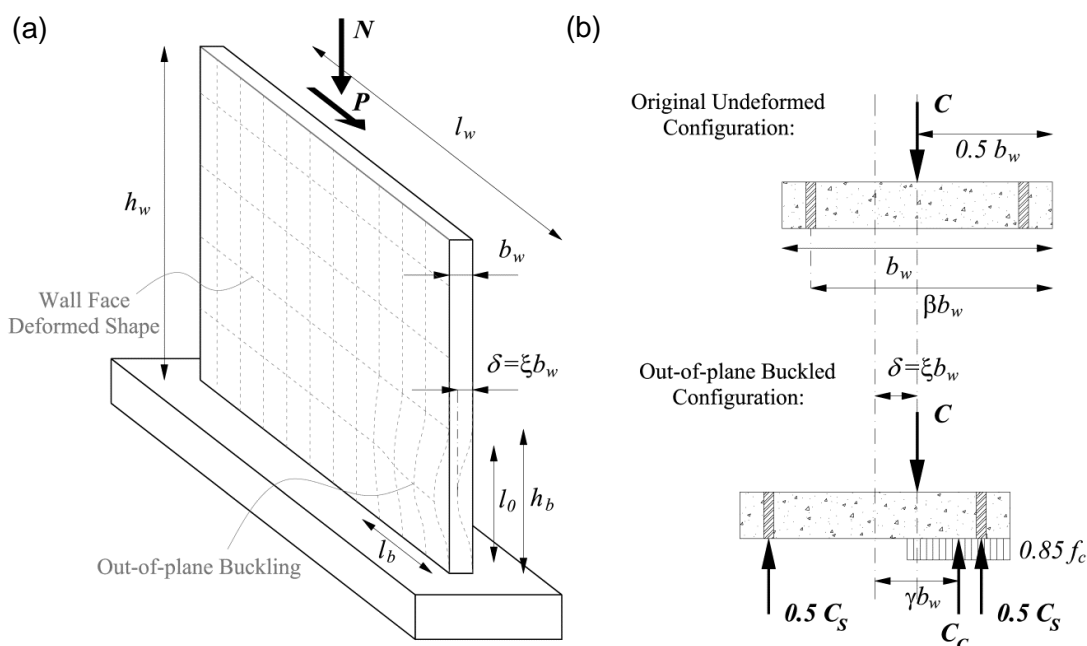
(a) Wall geometrical characterization; (b) Equilibrium of external and internal forces at mid-height of buckling region, adapted from Paulay and Priestley [6].
